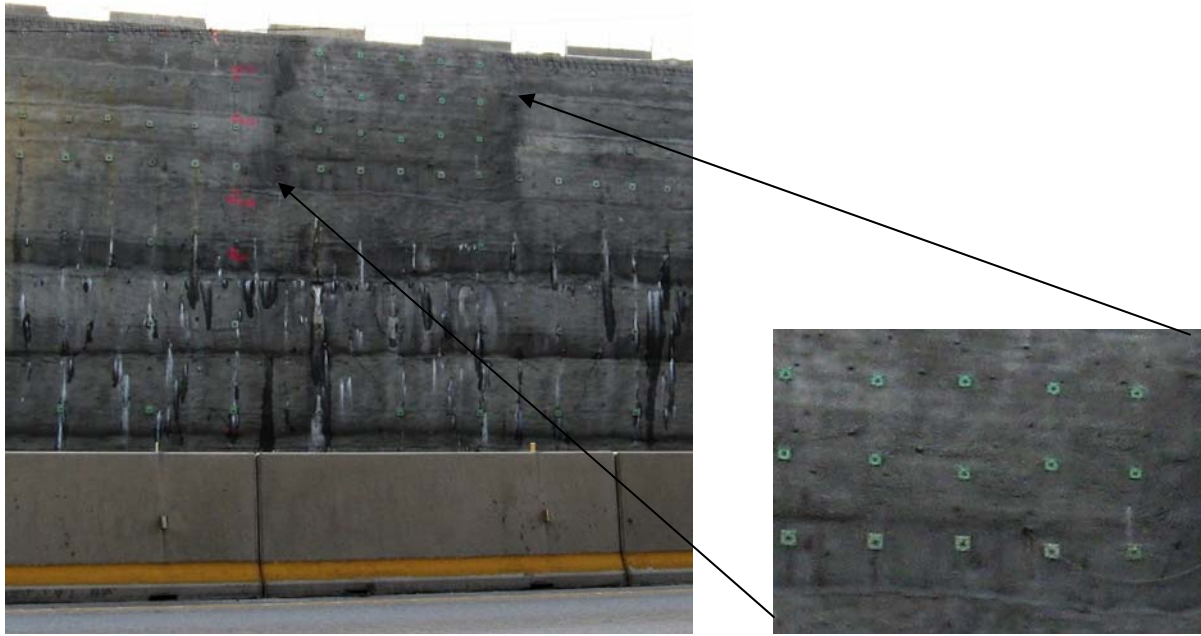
; Example of closely spaced rock anchors (nails) from a road cut along Interstate 76, outside of Pittsburgh, Pennsylvania. In addition to providing support to the rock mass, the anchors in this case help holding the shotcrete in place.
